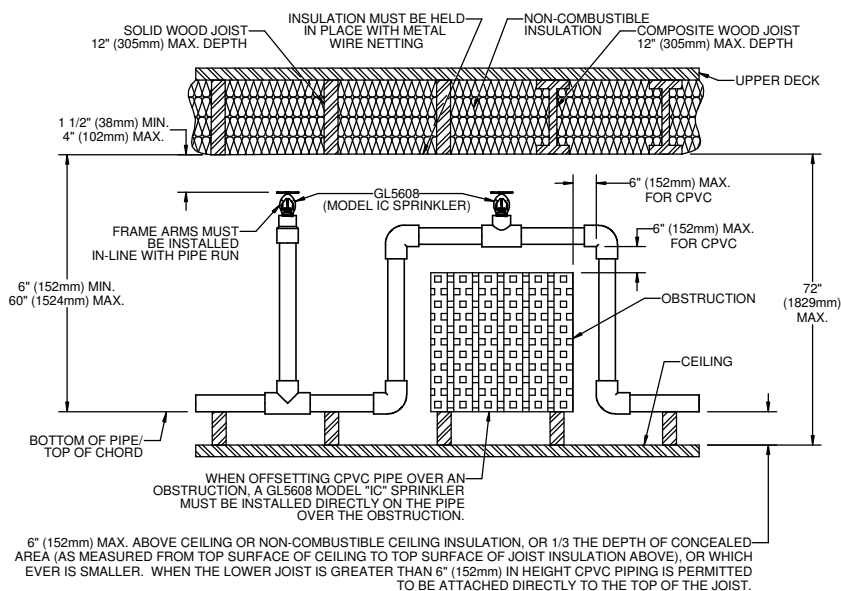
CPVC PIPE NON-COMBUSTIBLE INSULATION FILLED UPPER DECK SOLID WOOD OR COMPOSITE WOOD JOIST CONSTRUCTION
